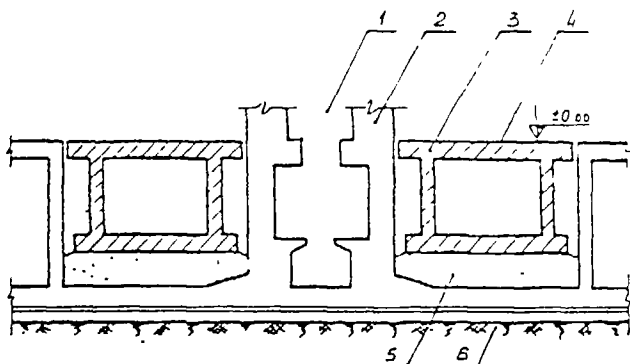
Schematic of vibration damping of the PIK horizontal beam tube hall.
